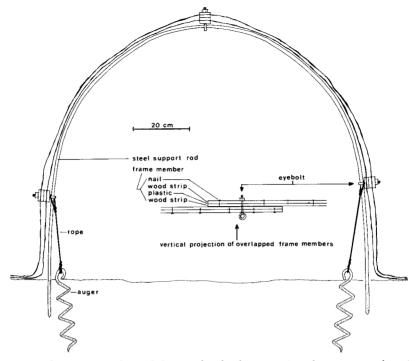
Cross section of tunnel showing details of construction where two tunnel sections join; drawn to scale.
